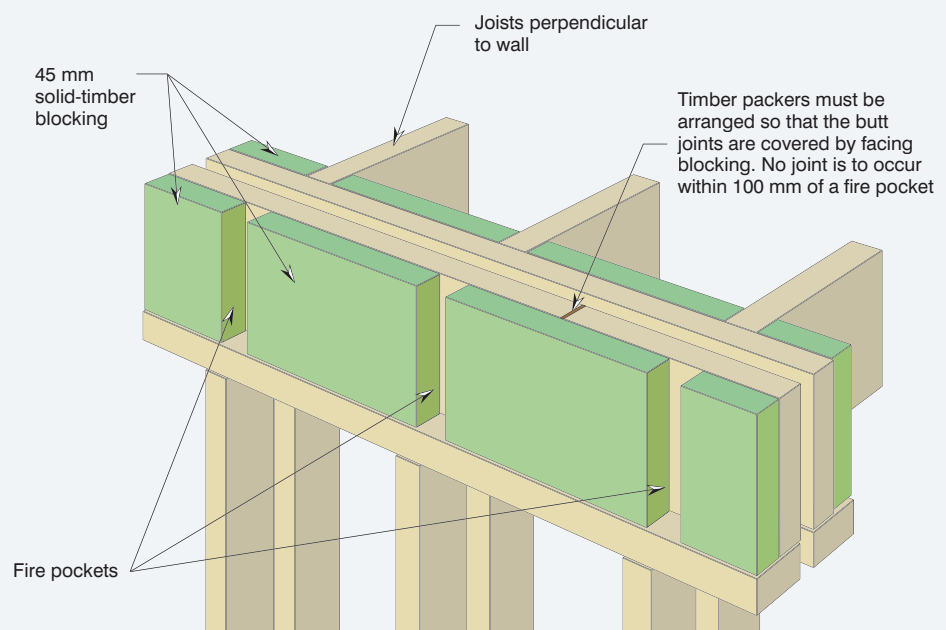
Pockets created in separating wall to accommodate floor joists – FRL 60 minutes only – perspective view.
